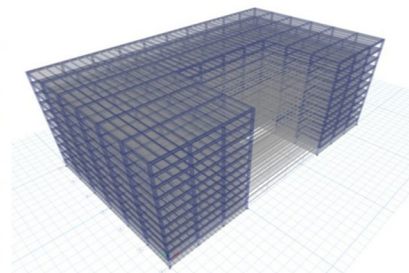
Model 4: Building with Secondary Beams a) Plan
